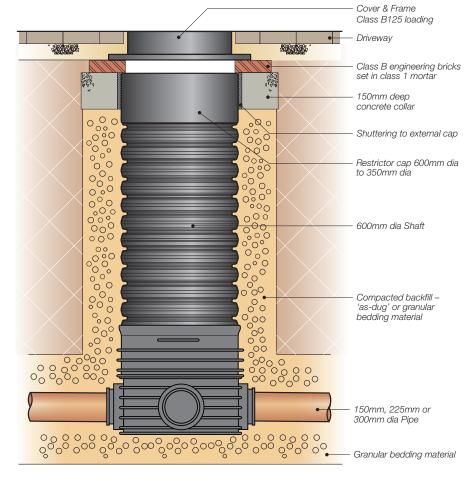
Typical installation detail: Range 600 Inspection Chamber. Type 3
